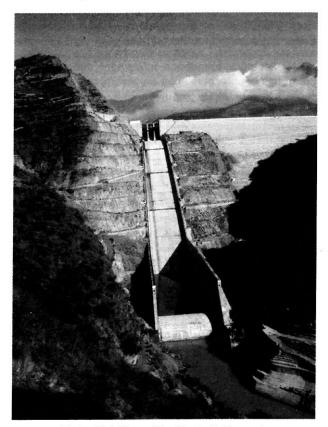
A View of the Chute Spillway at Tehri Dam Project
